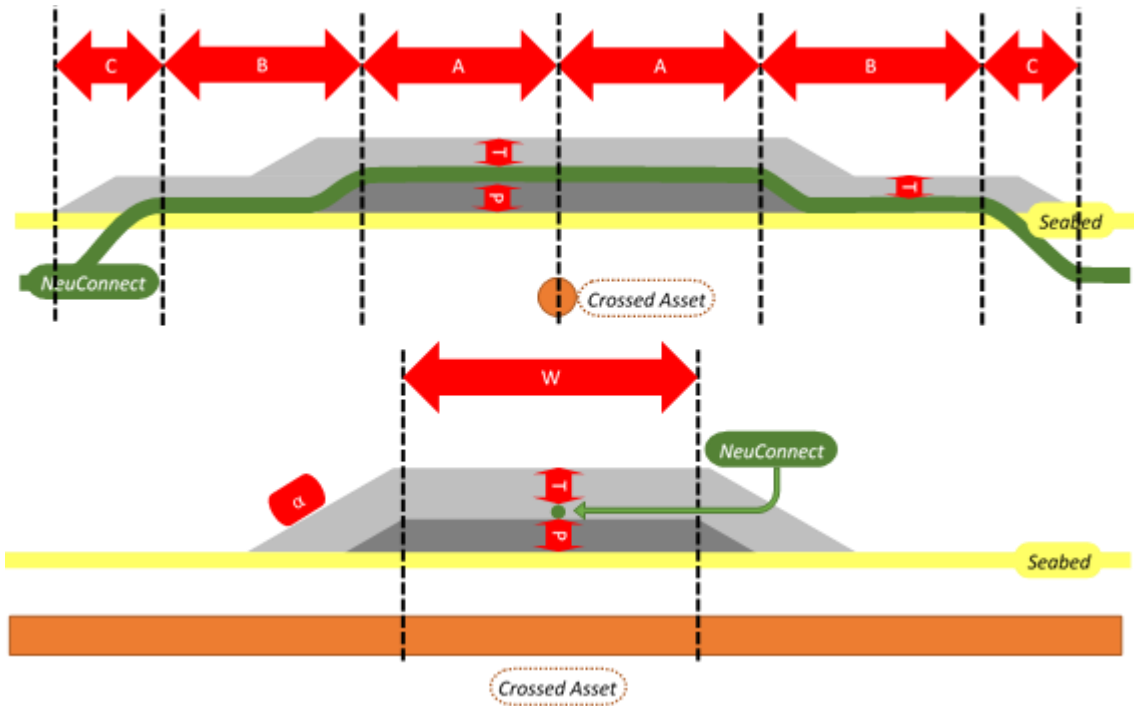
Definition of Proposed Dimensions Type B Crossing
